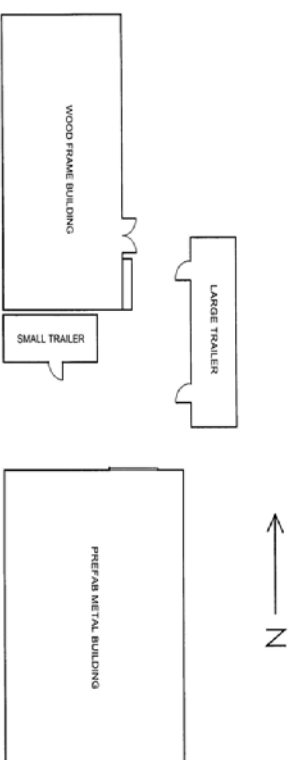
Corporation yard site plan showing the approximate layout of buildings.
